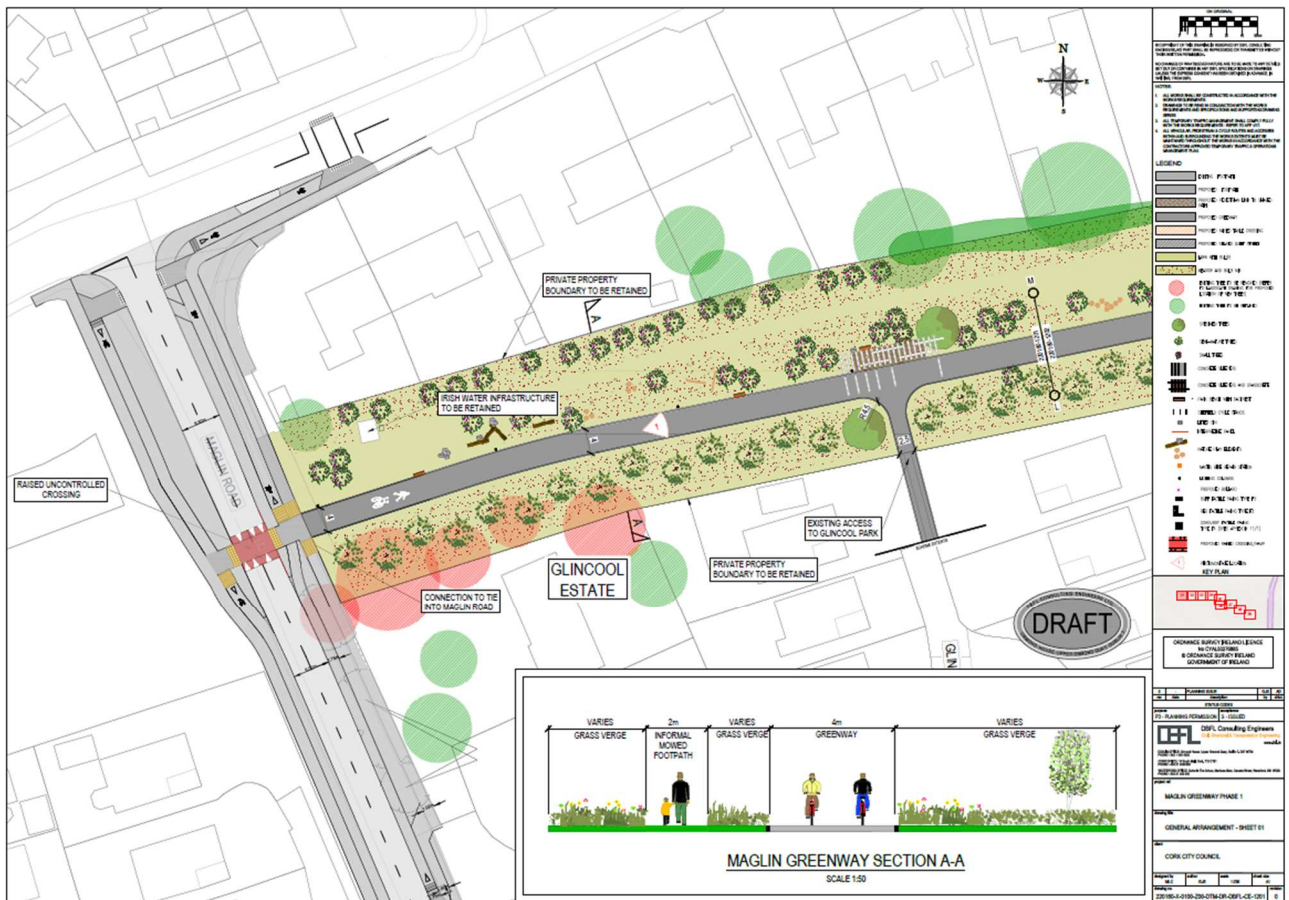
Proposed Route Detail 1 – Maglin Road commencement of route
